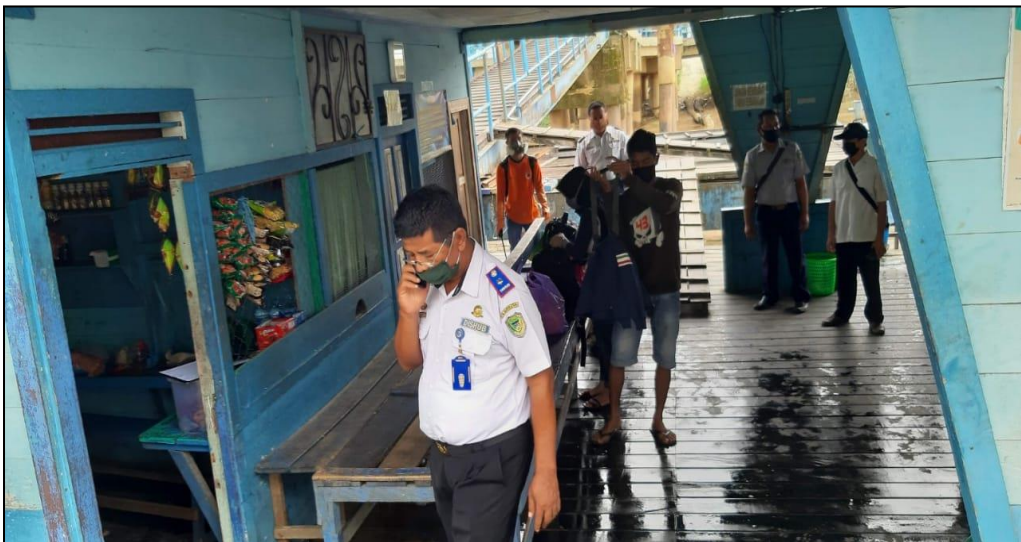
Condition of the Old Pier (UPT Jetty Muara Teweh) when it is loaded with loads
